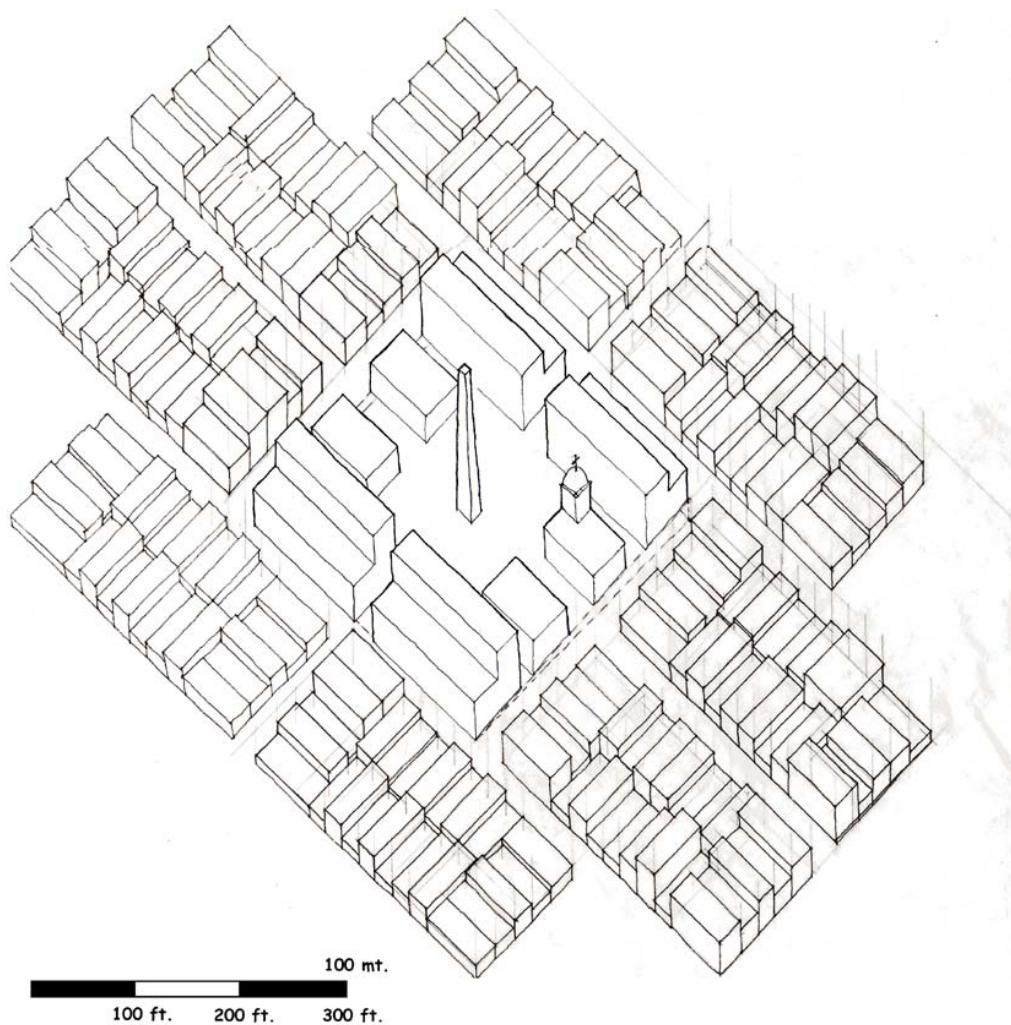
Savannah Scheme Axonometric. Massing steps down towards existing neighborhood to create a smoother transition between the 4 story core and the 2-3 story surrounding structures. The taller pieces are infill housing, while the buildings facing the plaza are institutional/community facilities.
